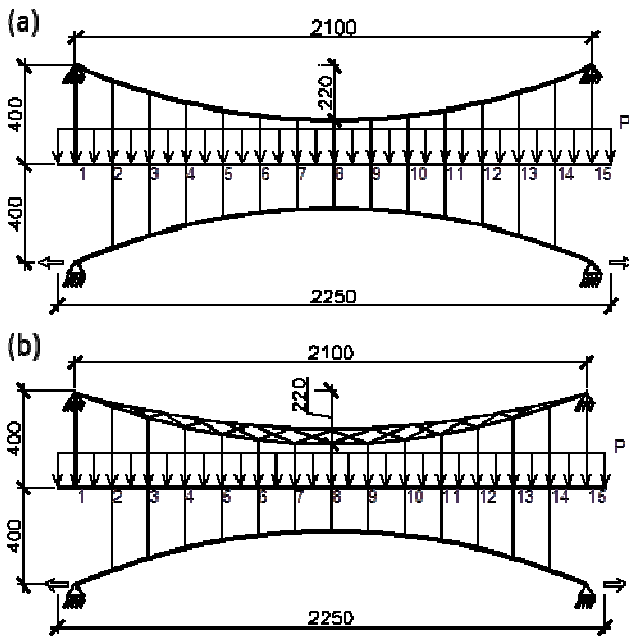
Scheme of the cable truss models.(a) – scheme of the model with single cable; (b) – scheme of the model with cable truss
